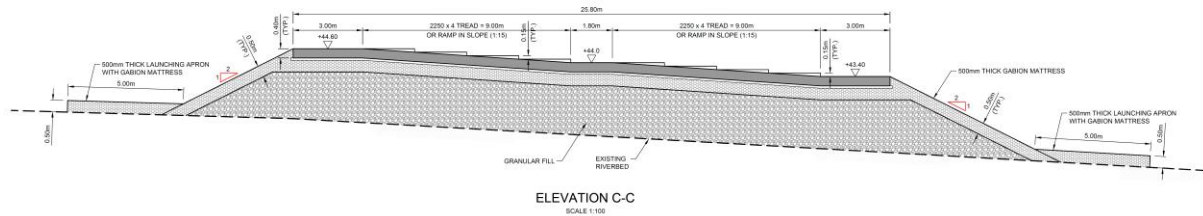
Schematic section showing slope protection scheme for approach bund with Gabion mattress
